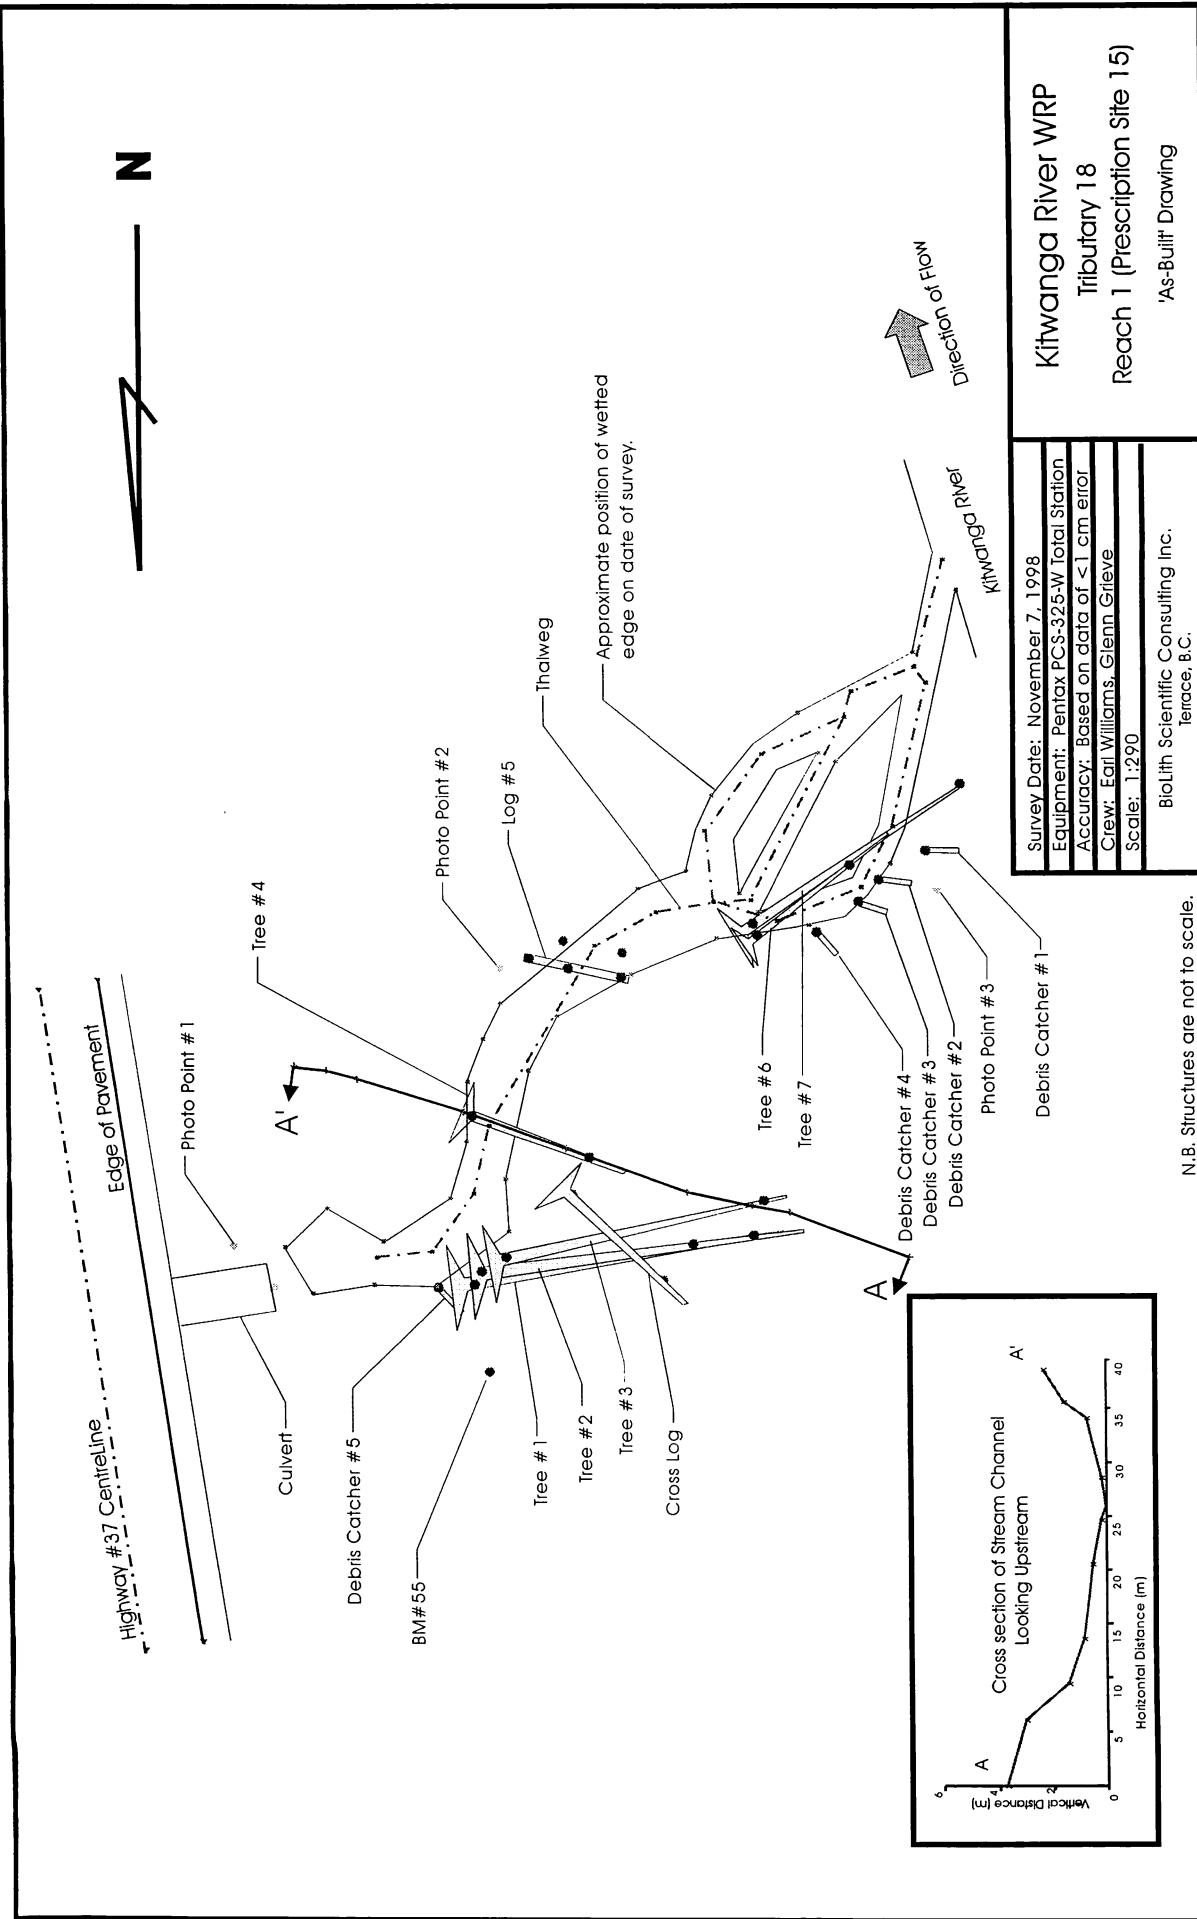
As-Built drawing of construction at Site 15 on Tributary 18 of the Kitwanga River South Sub-Basin.
